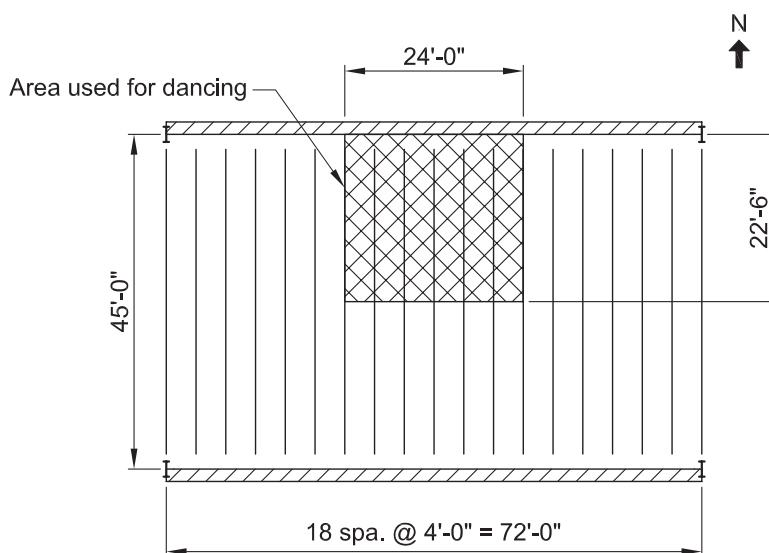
Framing and layout of dance floor for Example 5.1.
